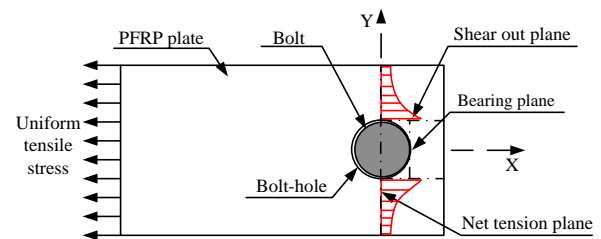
A single-bolt tension joint showing the principal planes where material failure is assumed to occur in design
